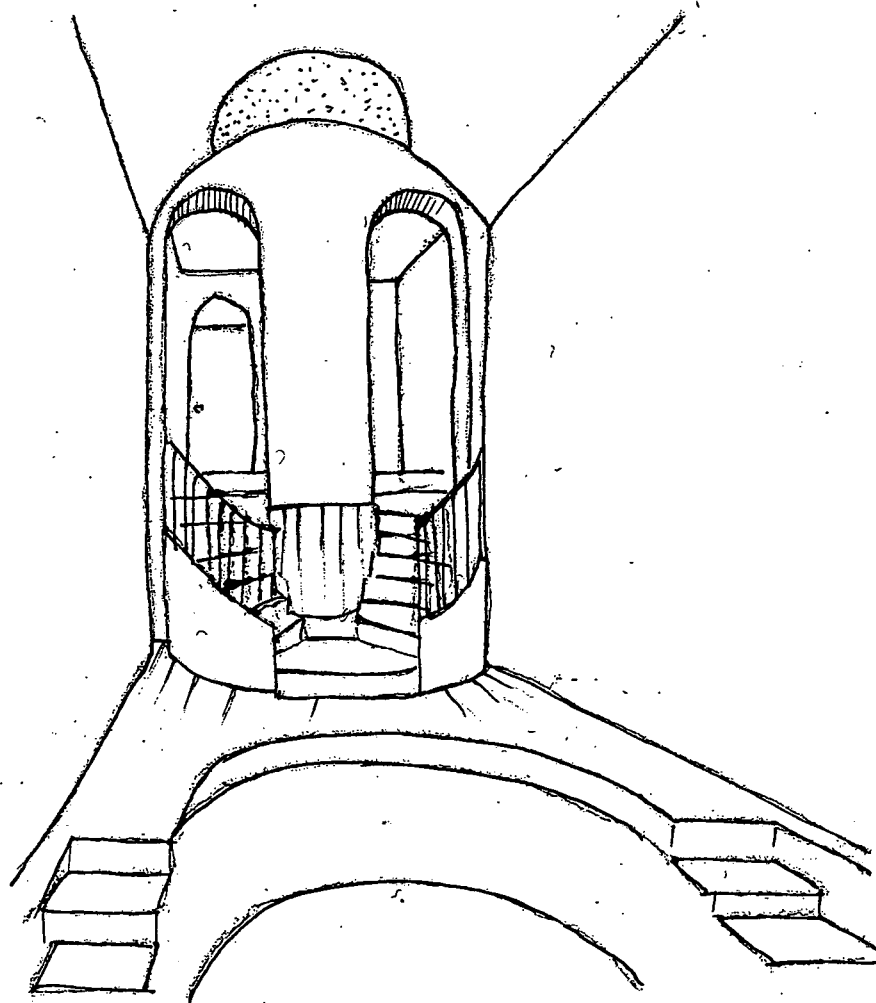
Historic bath house with rooflight shown dotted. Finishes are generally white throughout except for light natural wood floor and light wood cladding to central column where stairs join. Sides and floor of bath are sky blue finish.
